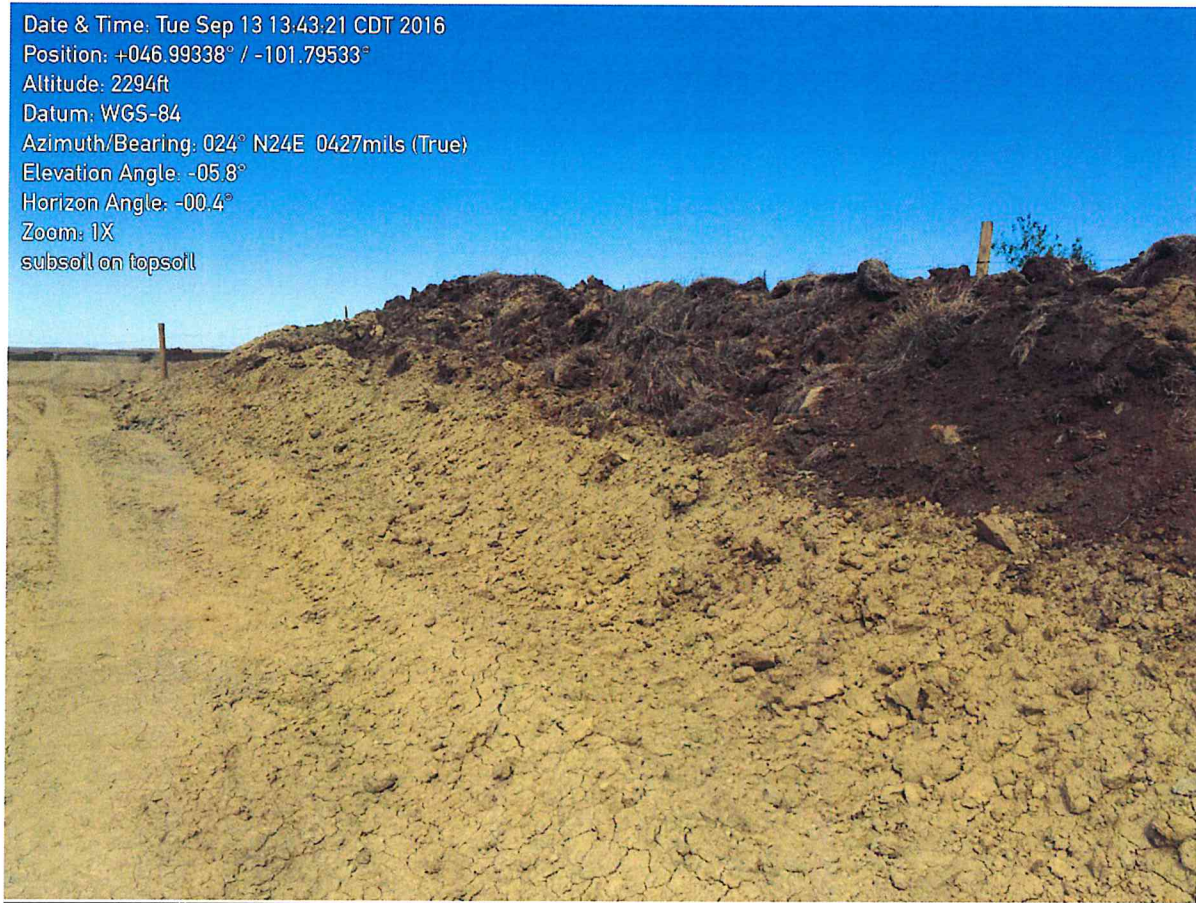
Subsoil plowed onto topsoil pile at 46.99338°N -101.79533°W.
